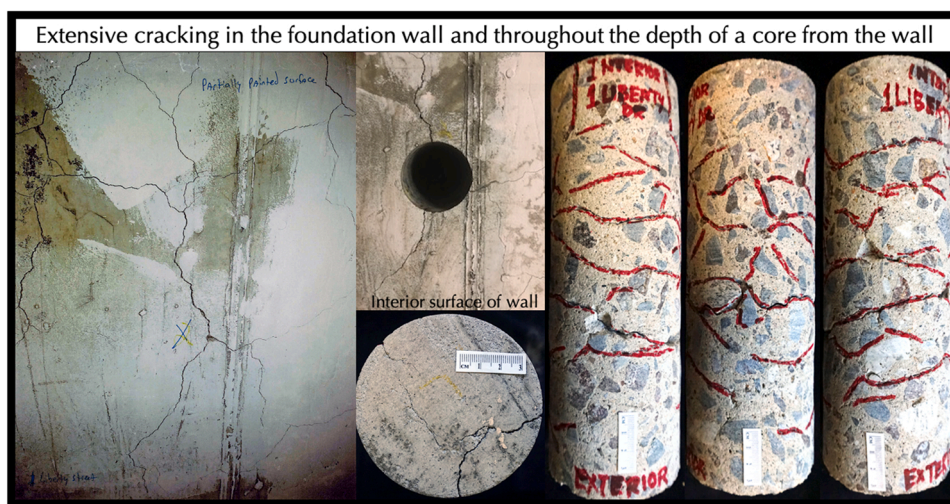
Cracking of a residential concrete foundation in the eastern Connecticut shown in the leftmost photo, which is the subject of this study. A core retrieved from over a visible crack in the foundation wall showed extensive cracking through the entire recovered length from the interior to the exterior surface of the wall, many of which are highlighted in red on the cylindrical surface.
